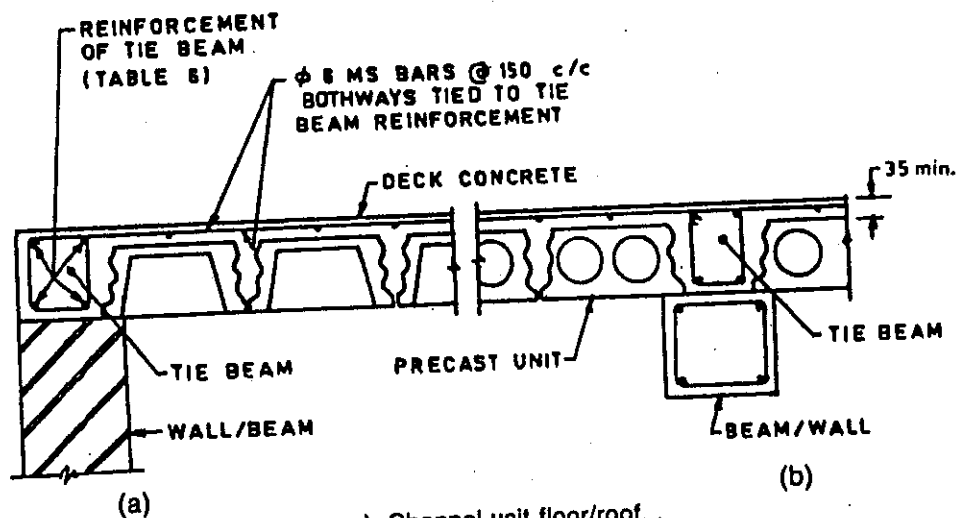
CONNECTION OF CHANNEL/CORED UNIT FLOOR/ROOF (WITH DECK CONCRETE) WITH TIE BEAM
